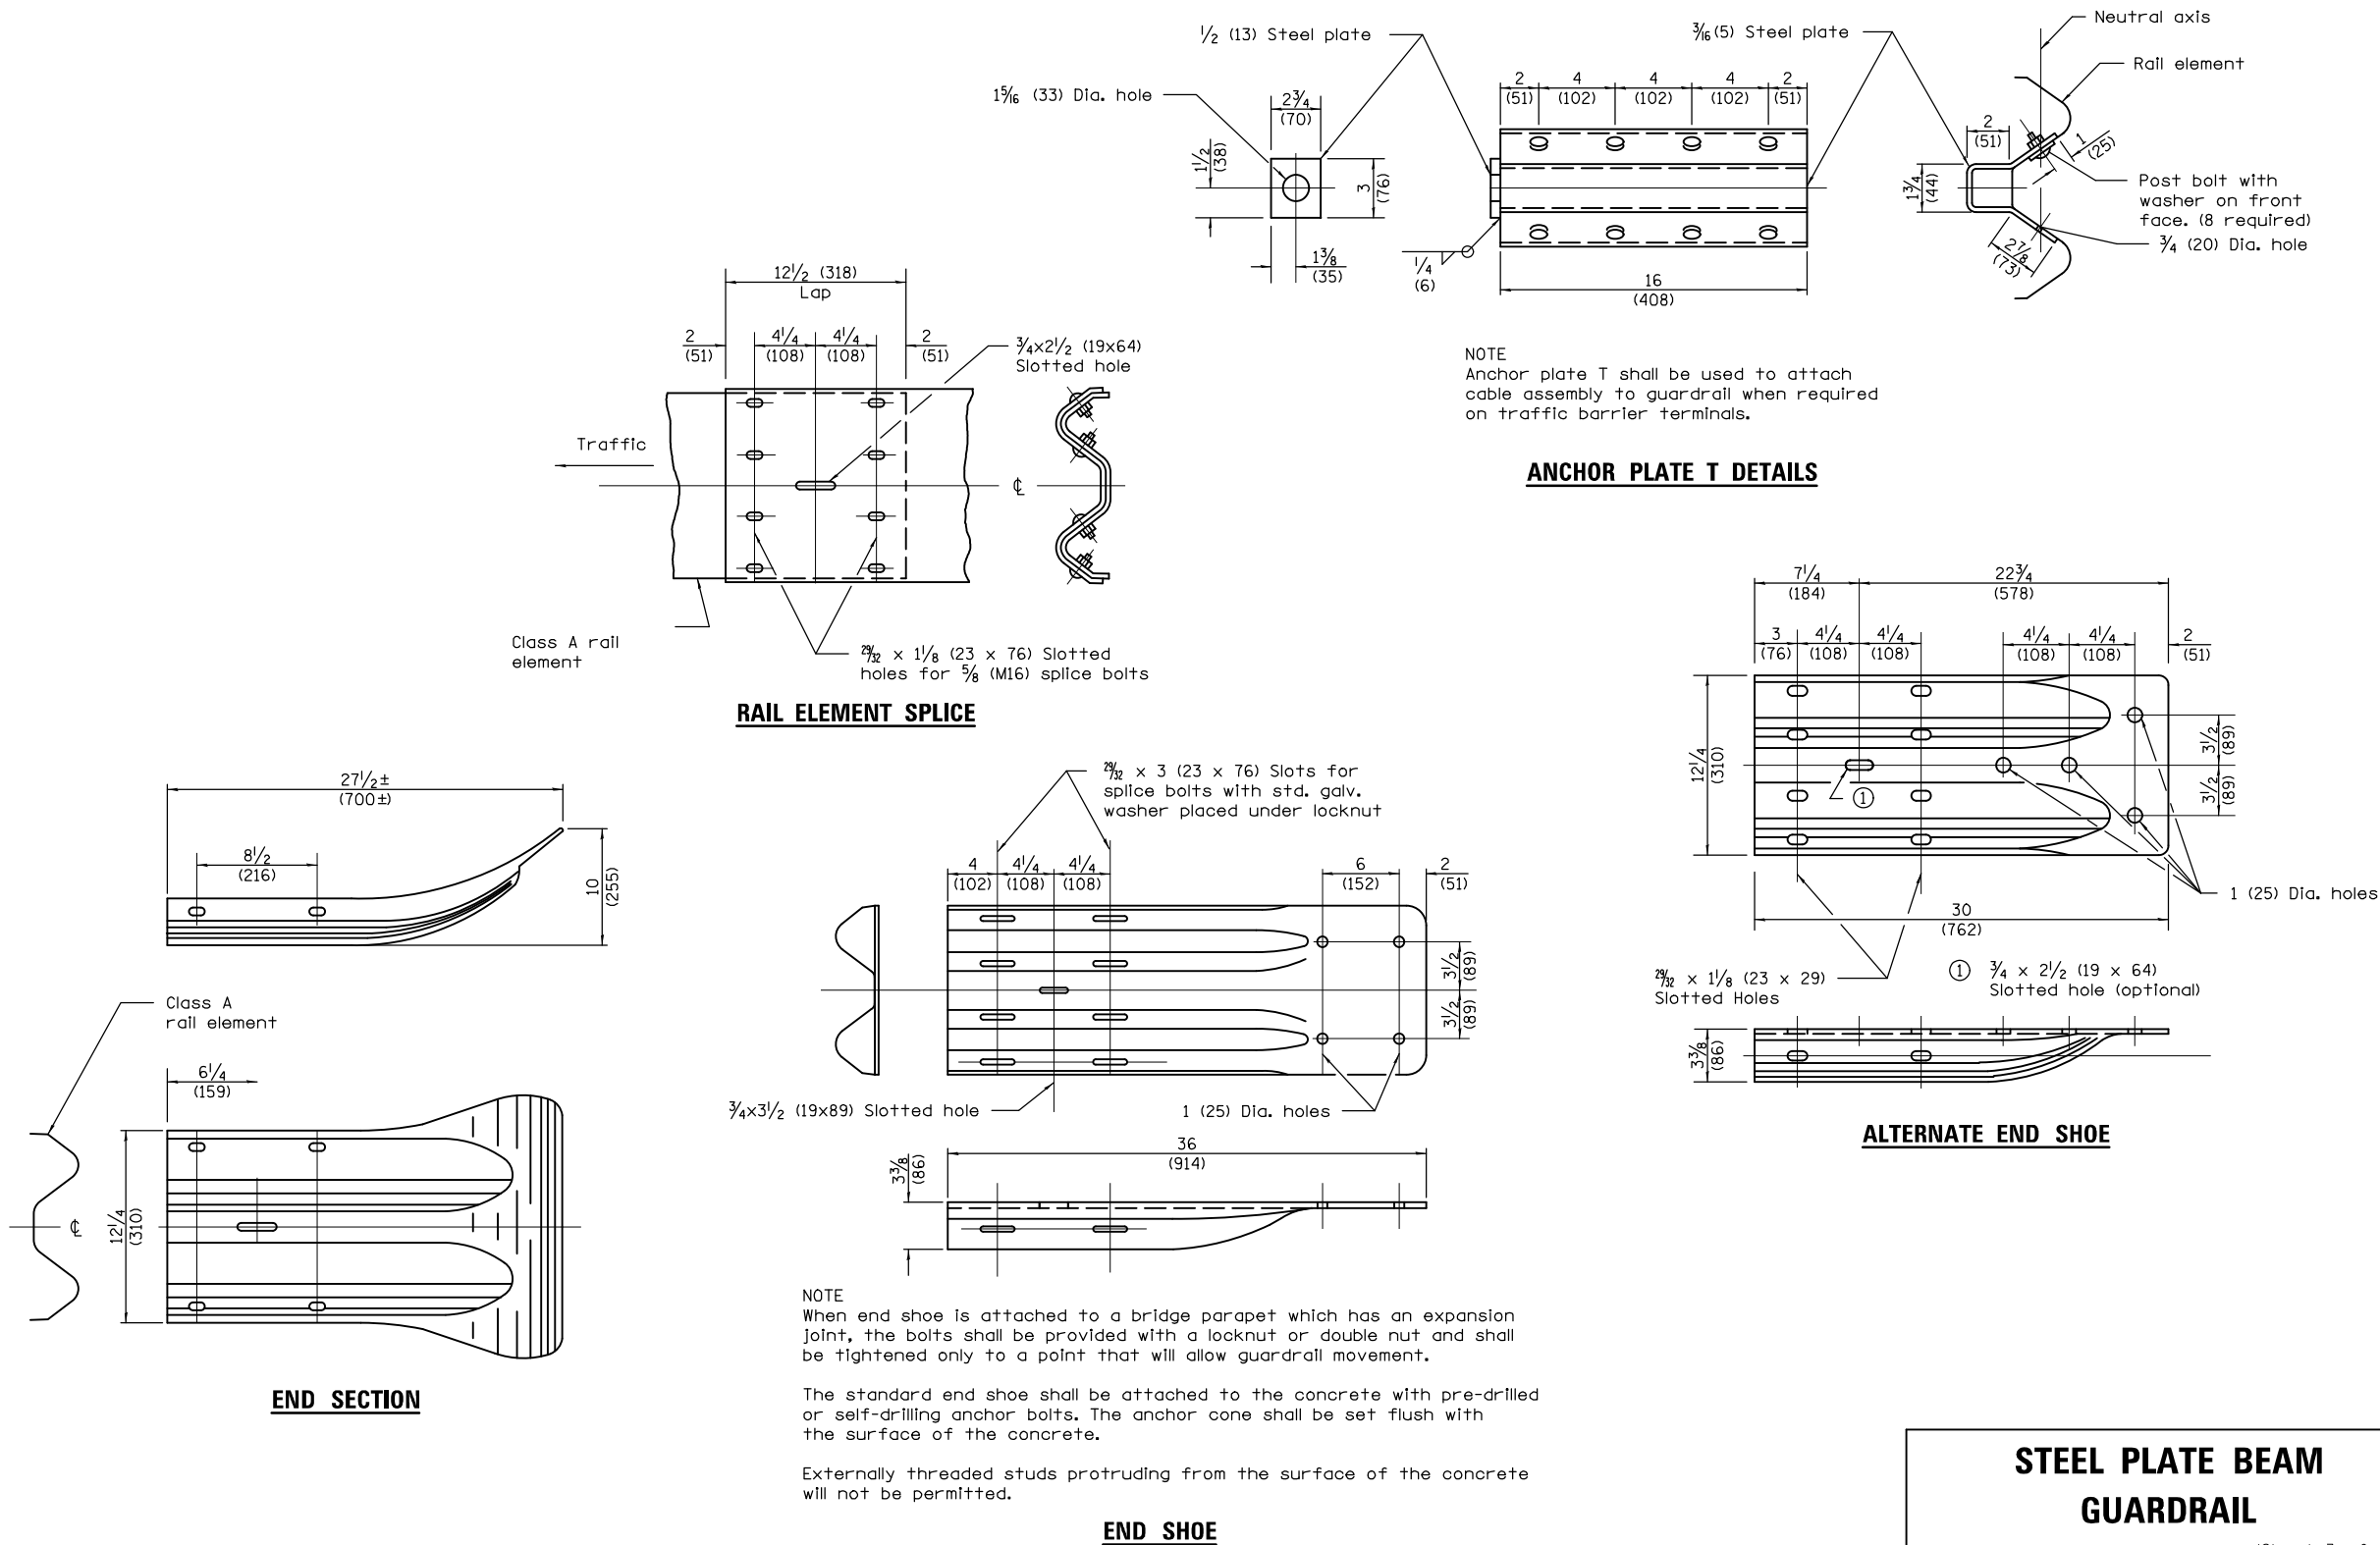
1/2" STEEL PLATE BEAM GUARDRAIL
